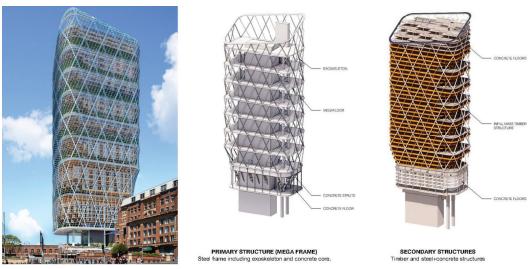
Exterior render and schematic showing primary and secondary structural frames.
